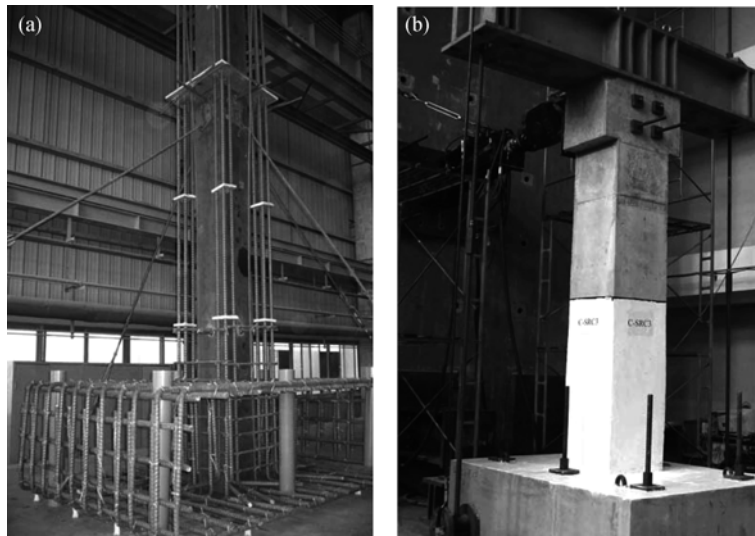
Arrangement of spirals and reinforcing bars of specimen C-SRC1.
